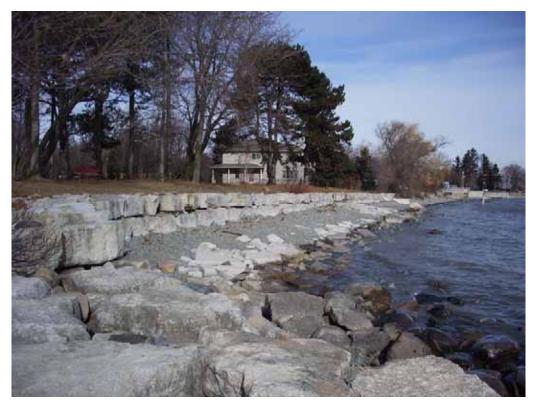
Watersedge Park – View east showing stacked armourstone wall with groyne in foreground
